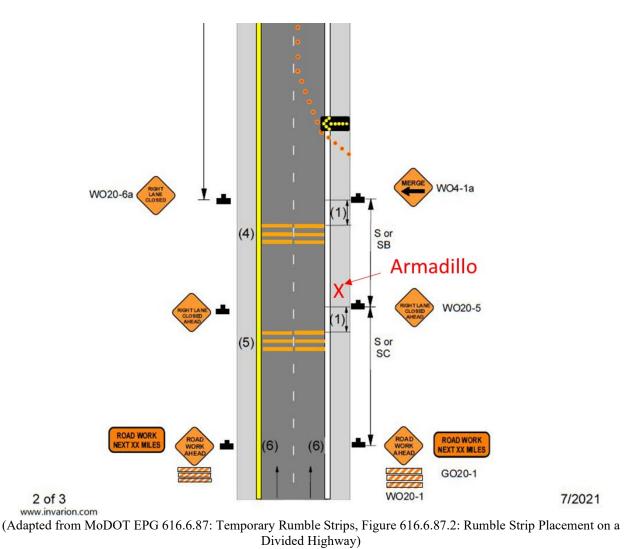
Armadillo placement for short-term temporary rumble strips on divided highway
